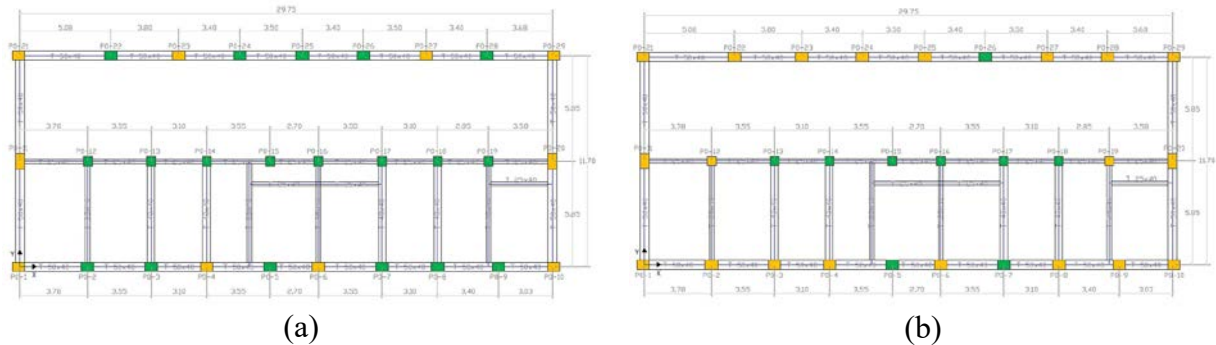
Plan disposition of seismic isolators and sliding support for: a) solution 10 and b) solution 20 (isolators in yellow, sliding supports in green)
